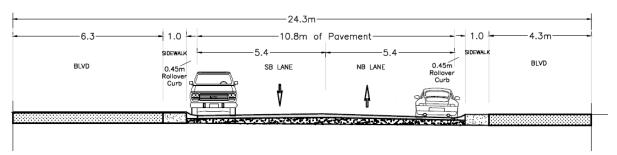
TYPICAL EXISTING CROSS SECTION FOR GLENBROOK BLVD, GEORGIAN WAY, AND GATEWOOD BLVD
